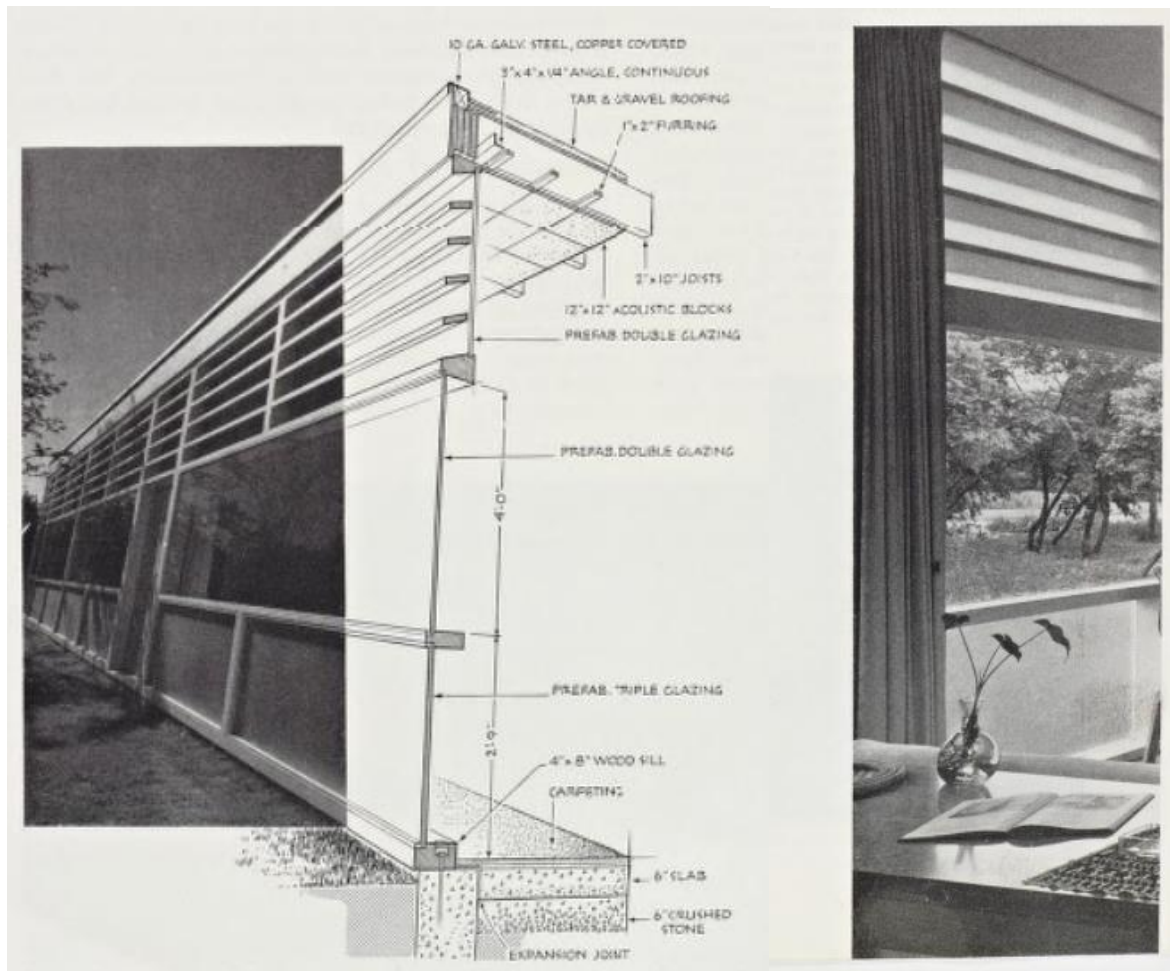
Combination detail drawing and photographs featuring the exterior, interior and the façade section
